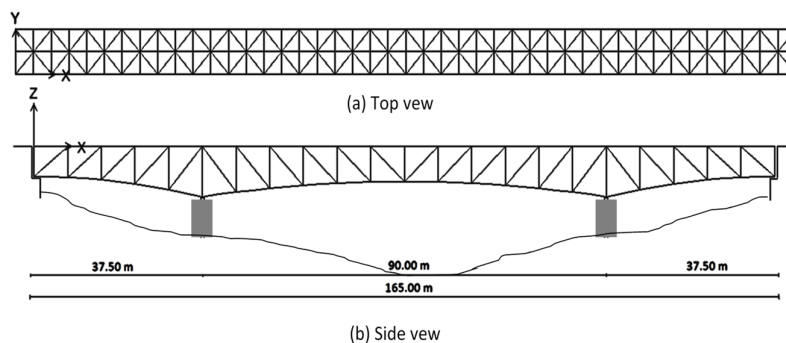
Truss bridge geometry: (a) Top view; (b) Side view
